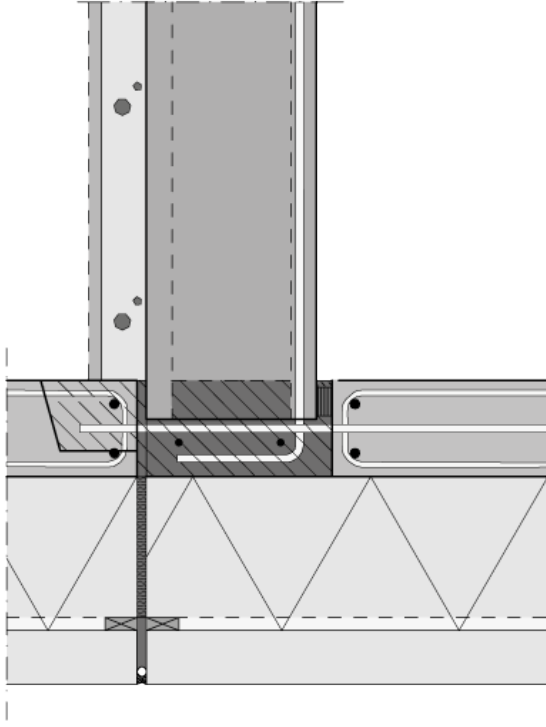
Examples of joints between precast concrete elements to DIN 1045-1 (dims. in mm)
